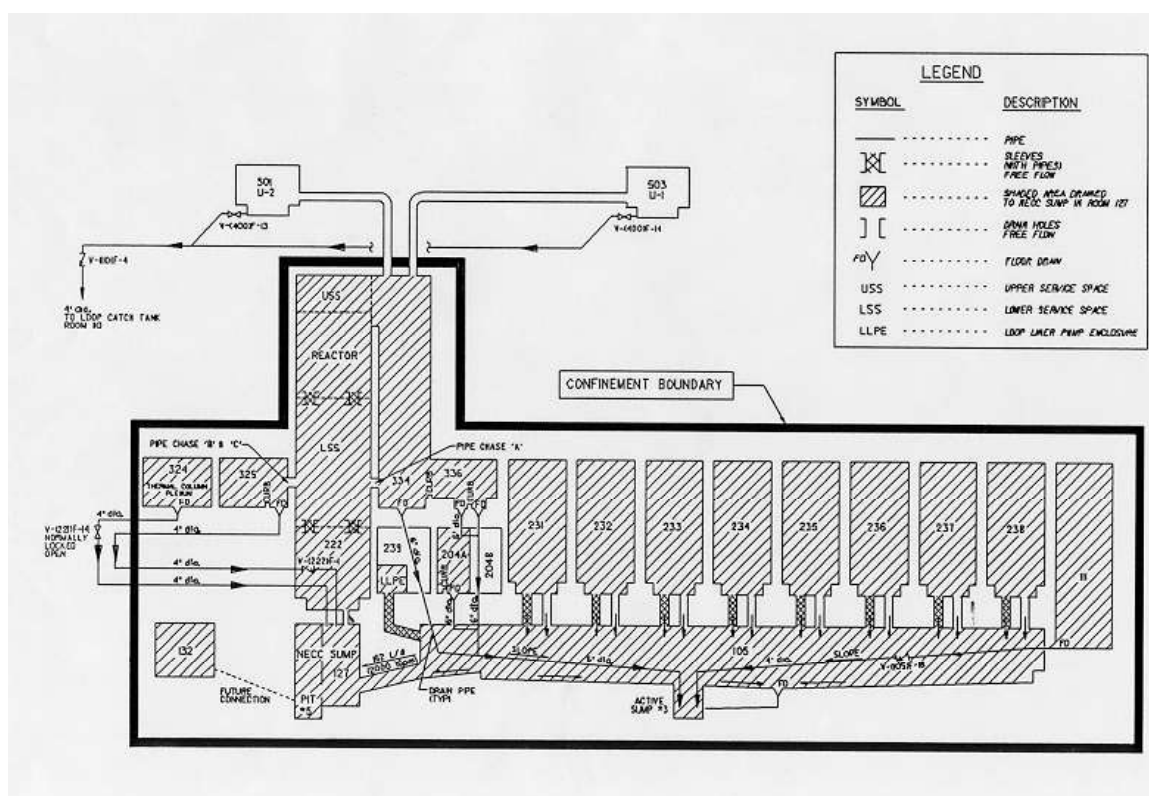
NECC and Liquid Confinement Drainage Upgrades Flowsheet
